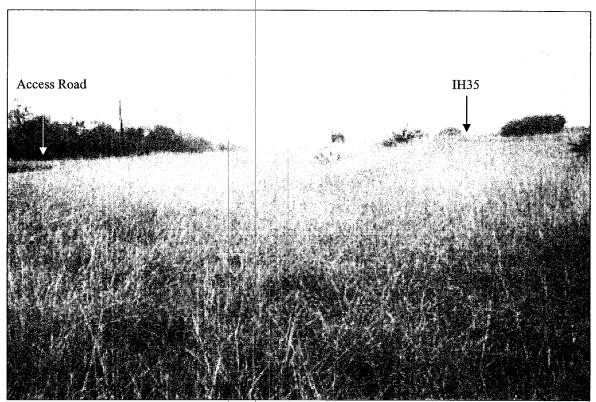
View facing South of V-shaped strip between IH35 and the access road.
